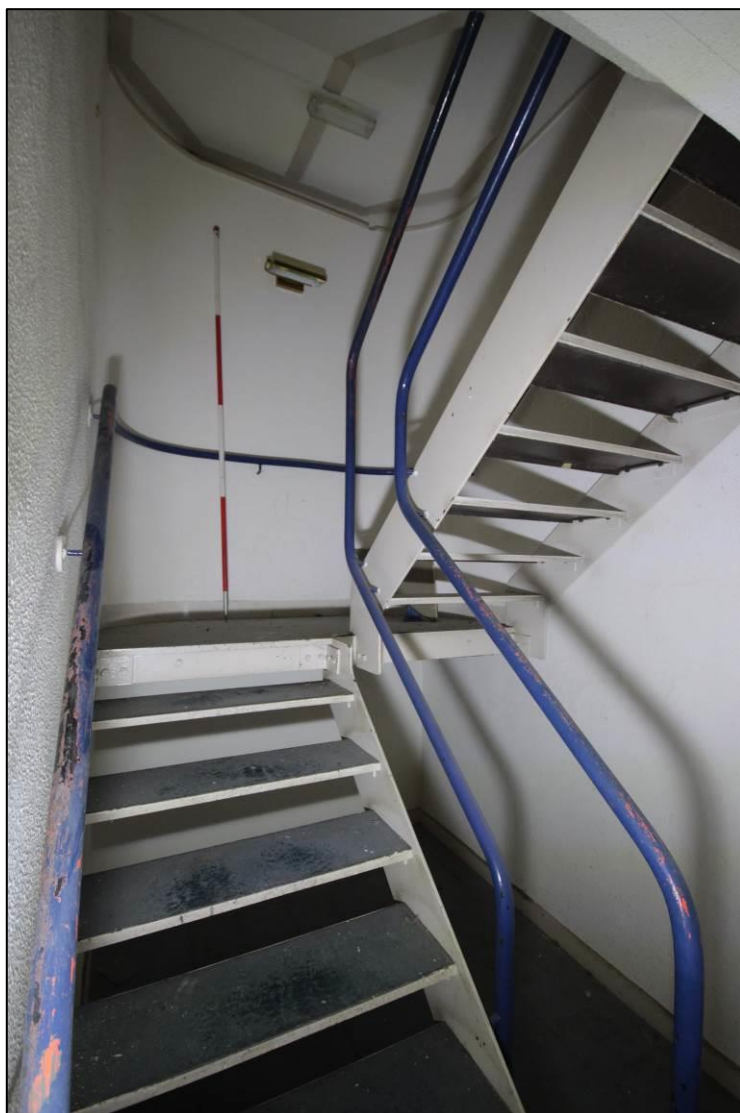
View of the metal western staircase from the basement, taken with 2m scale facing south-west
